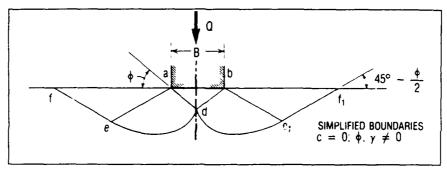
Failure surface assumed in bearing capacity formulas (modified from Terzaghi and Peck, 1967).
